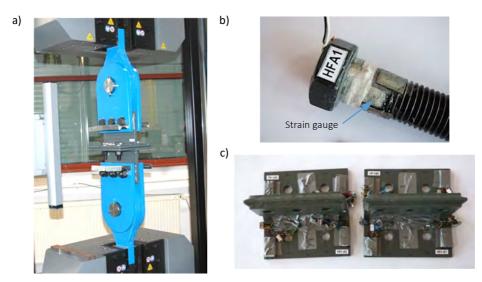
Sample H01: a) sample of series H01 in a testing machine after damage; b) location of strain gauge in the bolt; c) location of strain gauge in the sample of series H01
